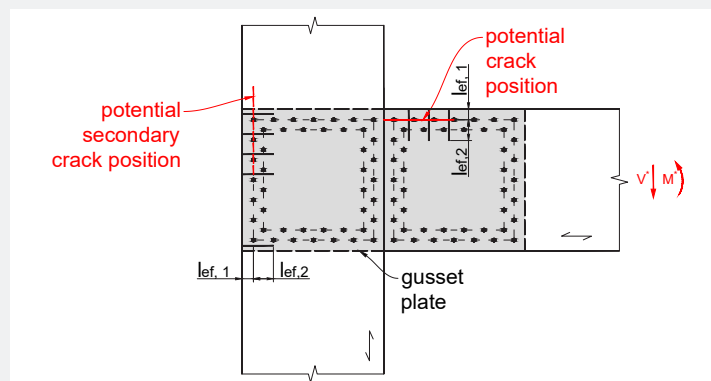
Reinforcement of a moment-resisting beam-column joint (reinforcement required for load reversals not shown for clarity).
